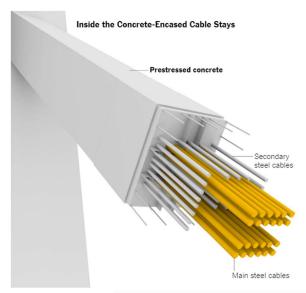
3D View of the stay cable system [18]
